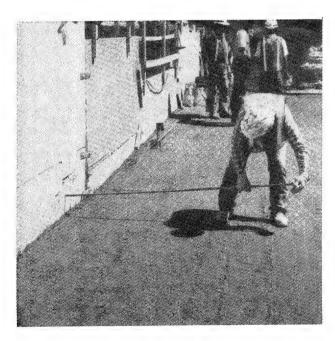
Precast concrete stay-in-place forms on the upstream face of Cuchillo Negro Dam (from Gehring 1991)
